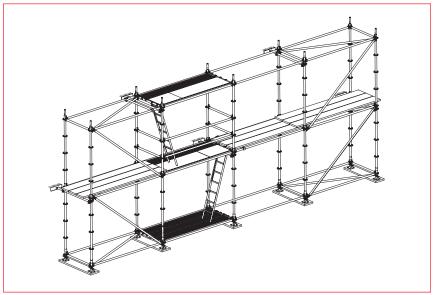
Example showing the scaffolding anchored to the facade
